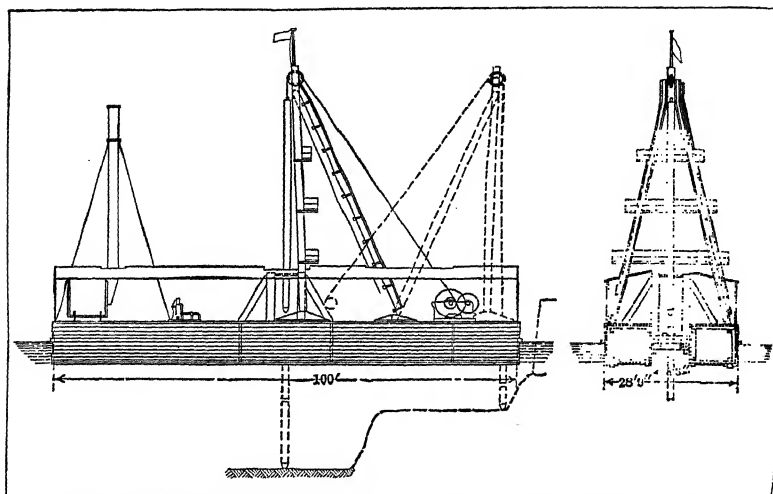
A.—Side elevation and cross section of Lobnitz rock cutter.
